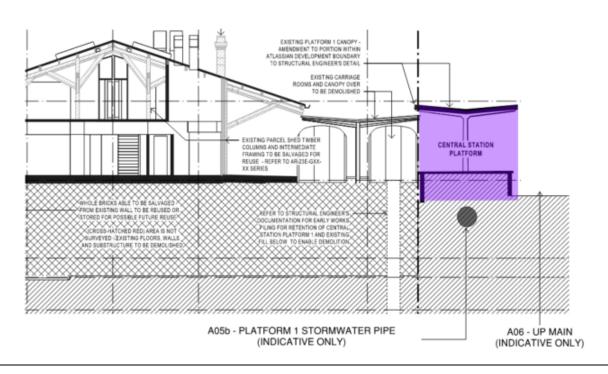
Cross-Section Elevation View of Platform 1 (BVN Dwg, AR-23D-GXX-02[5])
